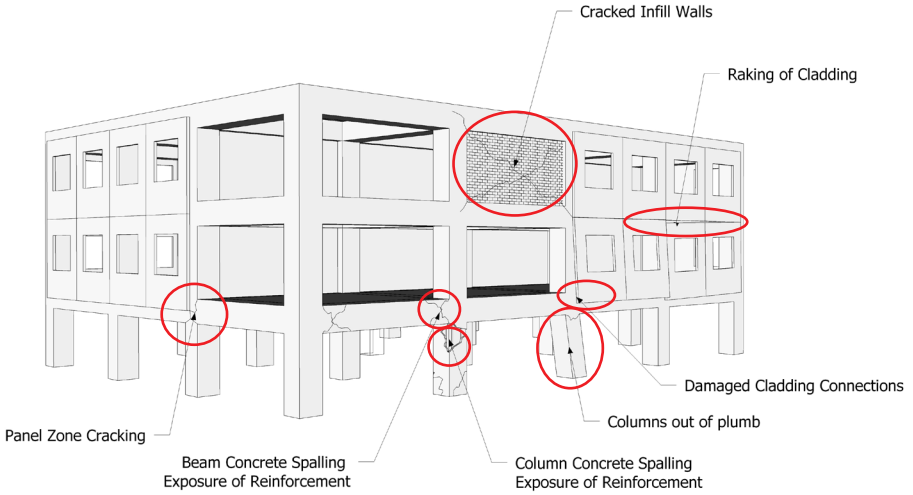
Typical damage areas in reinforced concrete-frame structures
